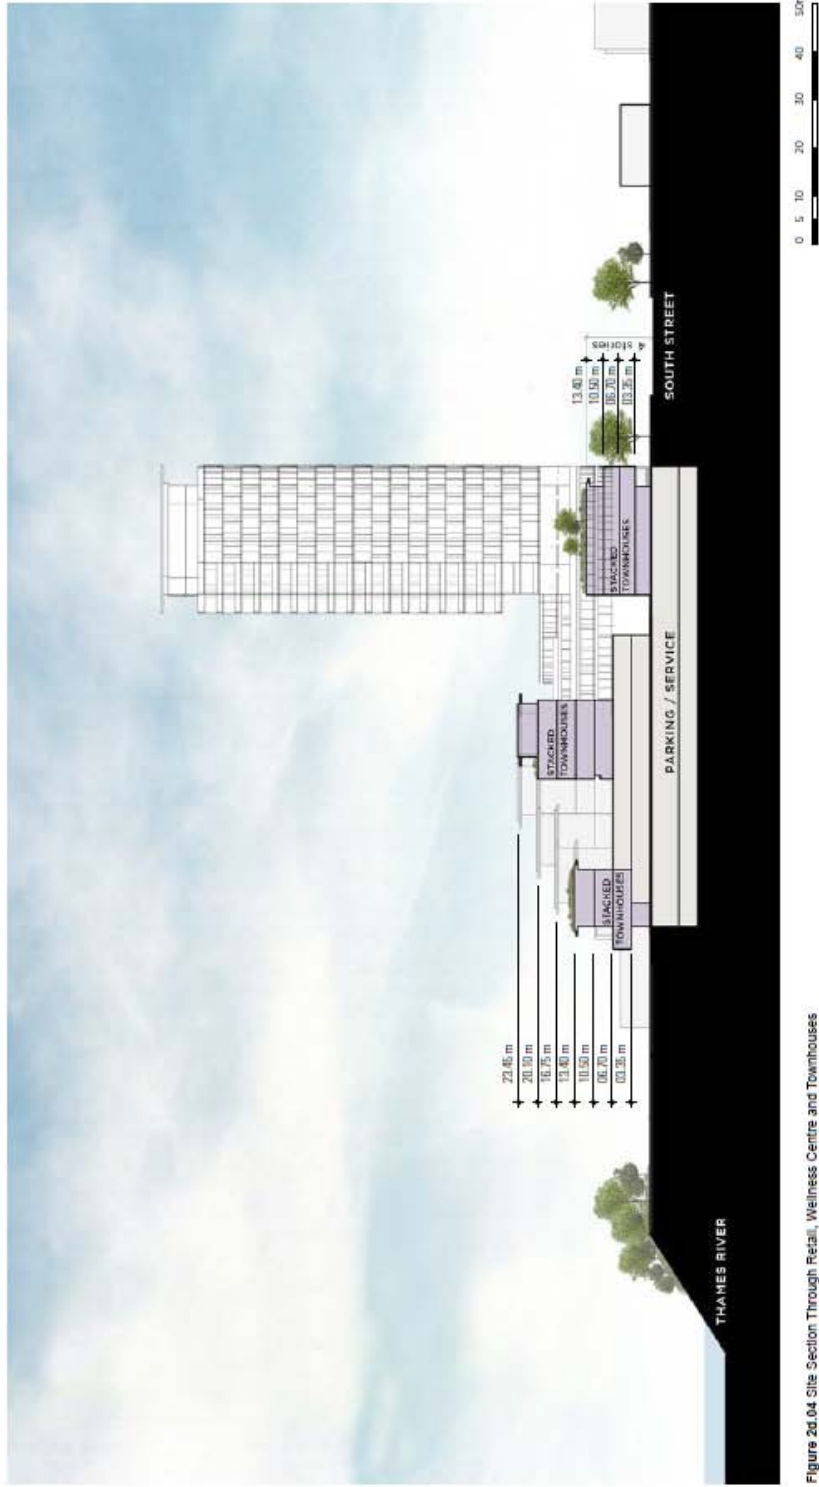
04 Site Section Through Retail, Wellness Centre and Townhouses
